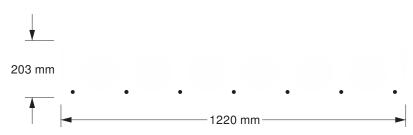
One 203 mm concrete hollowcore floor slab cross-section (nominal dimensions shown - not to size)
